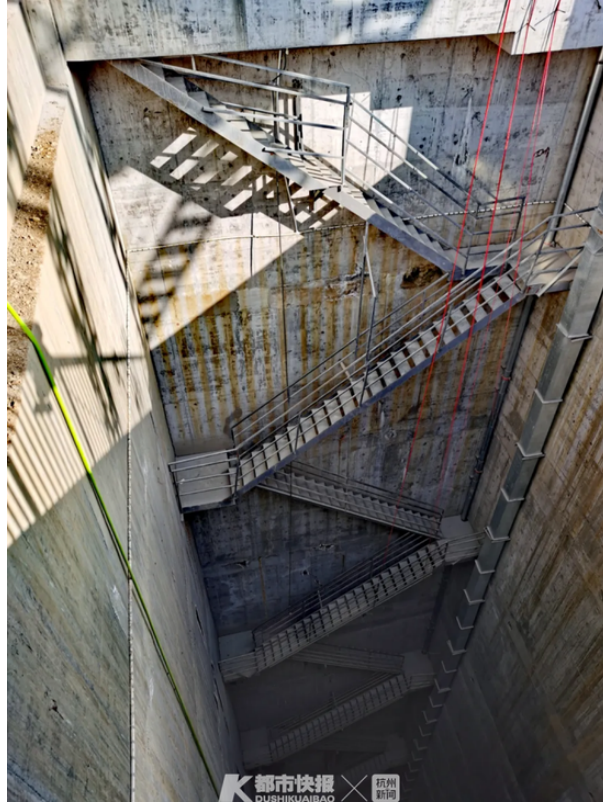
Jingfangyuan Underground Parking -the deepest underground parking lot in Hangzhou, China (Rui, S. 2021)
